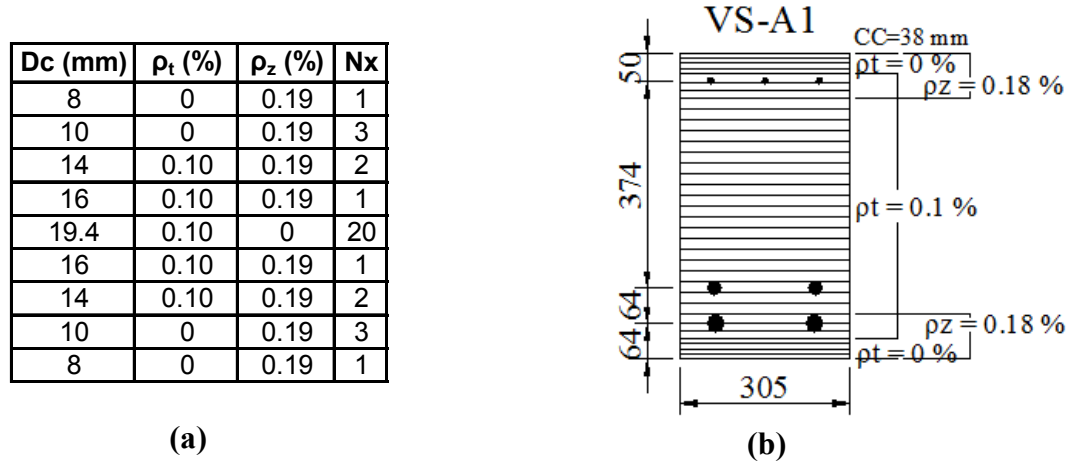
Sectional Model Details for Beam VS-A1: (a) Assigned Smeared Reinforcement Ratios; (b) Concrete Layers
